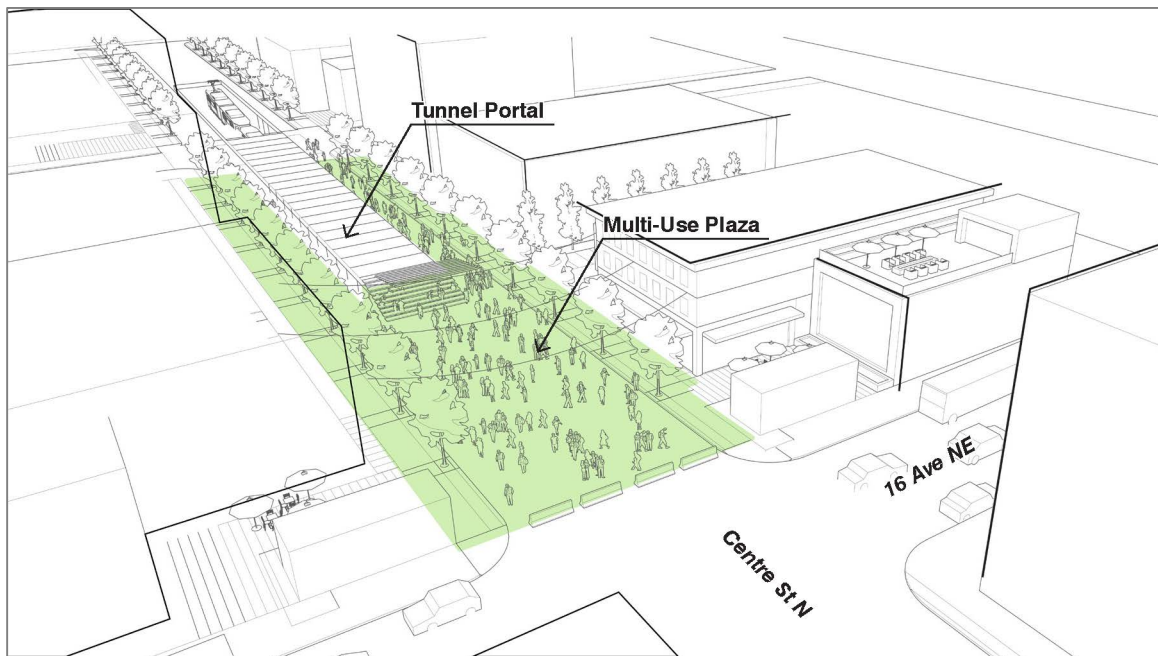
16 AVE MULTI-USE TUNNEL PORTAL PLAZA
